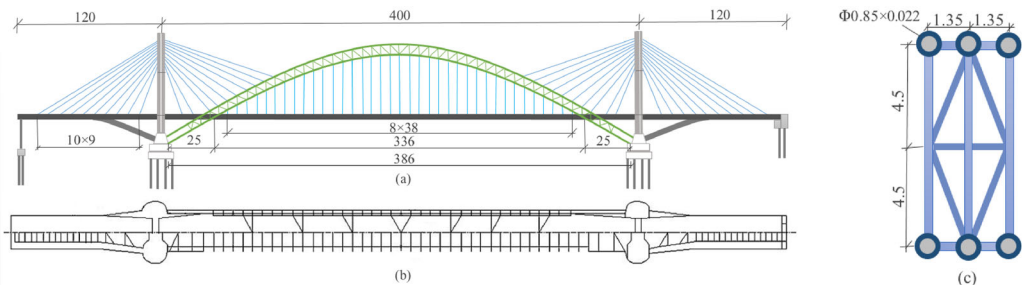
General view of the cable-arch bridge (values in meter): (a) elevation (b) Plan (c) cross-section of main arch rib.
